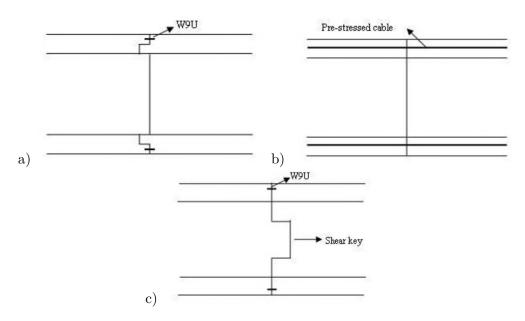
Side view of a) Dutch 'flexible' joint b) Japanese 'stiff' joint c) Intermediate joint (Van Oorsouw, 2010)
